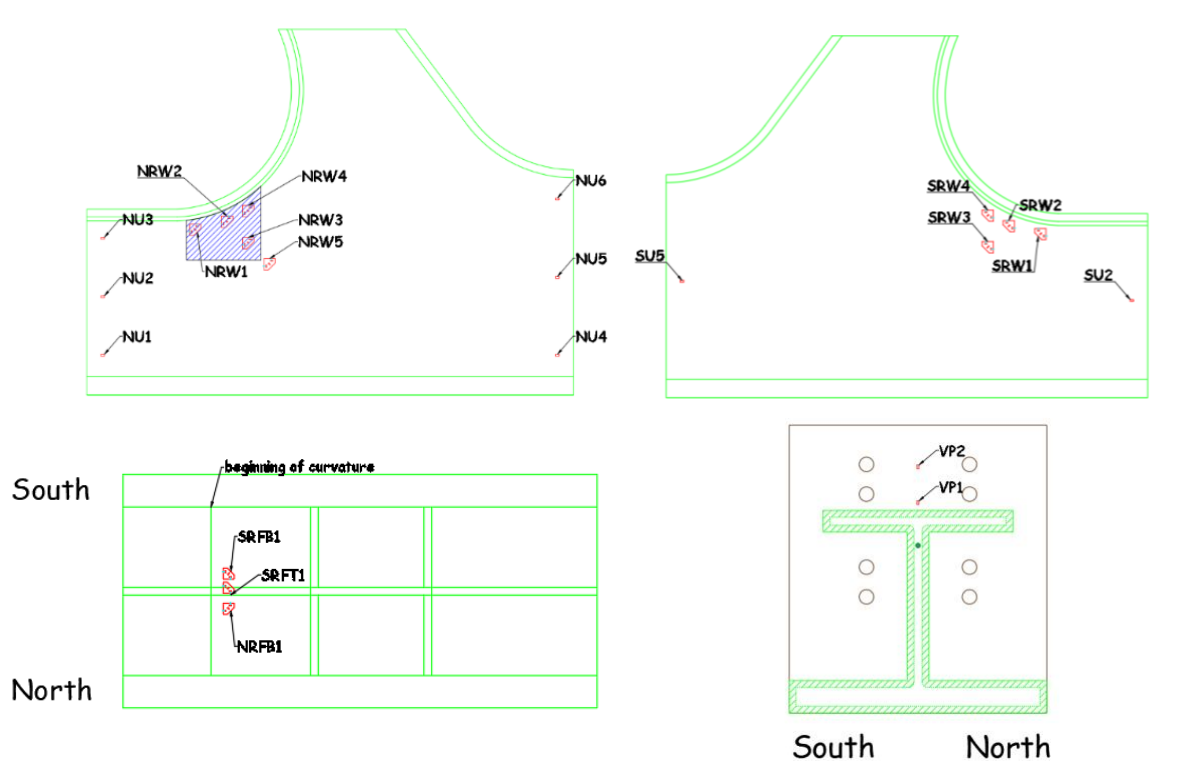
Strain Gauge Instrumentation – (left to right) North Elevation, South Elevation, Plan View, and East Elevation. DIC area of interest is depicted by the blue hatched area
